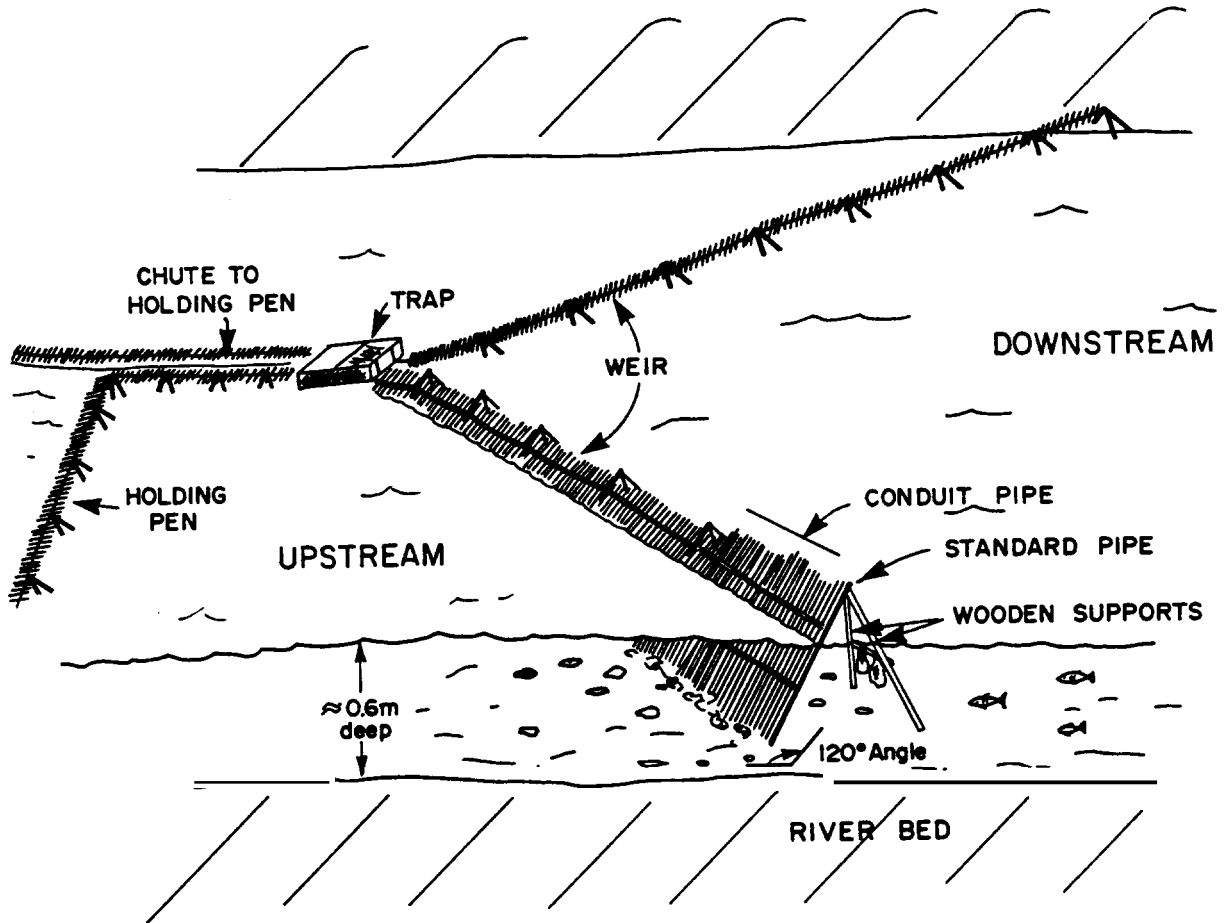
Side view of layout of conduit pipe weir used in 1981 showing underwater details.
